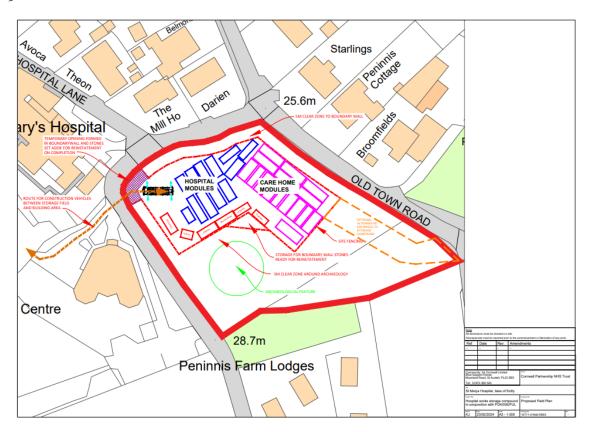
Plan of the proposed access, storage are and site compound. The scheduled platform cairn is hatched in red.
